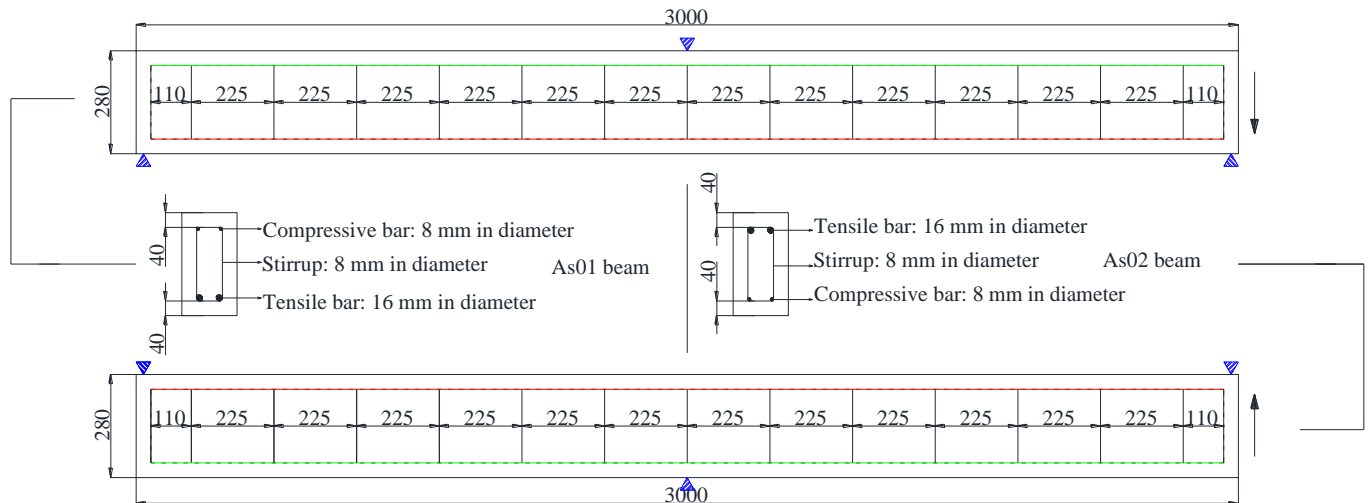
Layout of reinforced concrete beams (all dimensions in mm)
